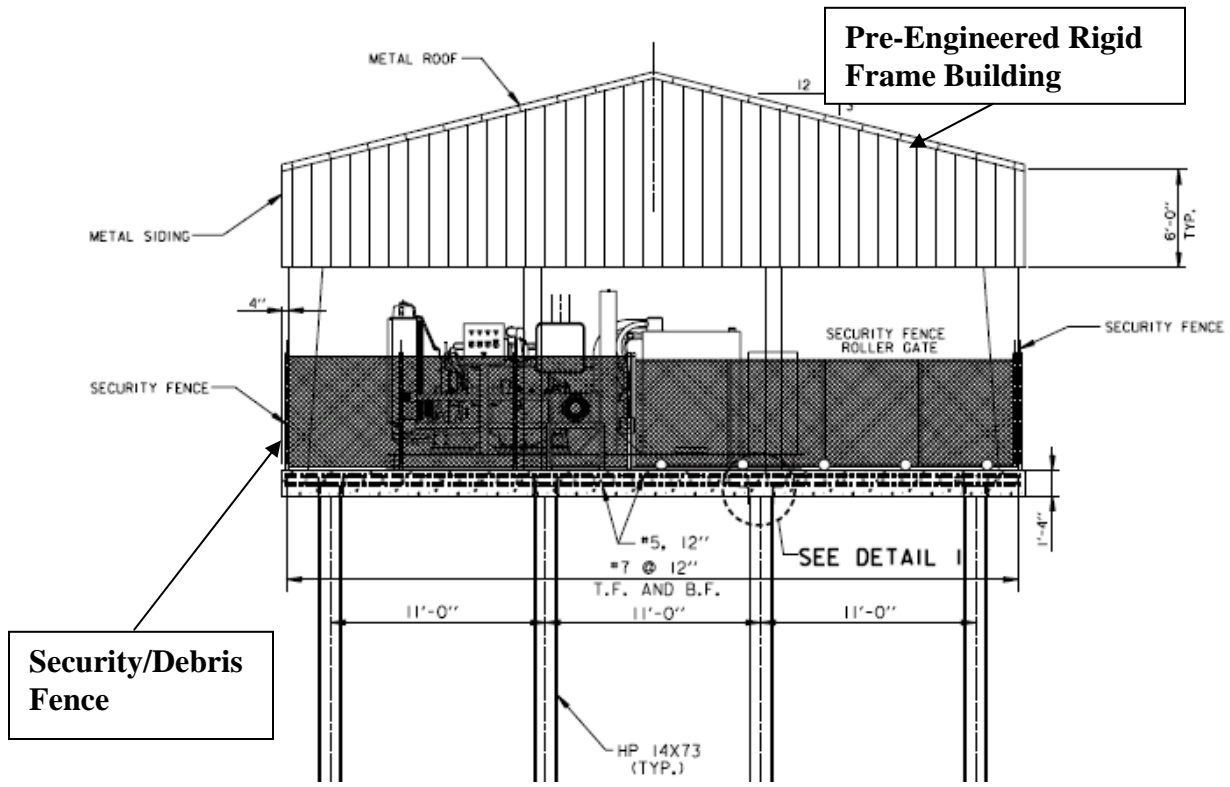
Orleans Avenue Phase 1 Engine Platform End Elevation
